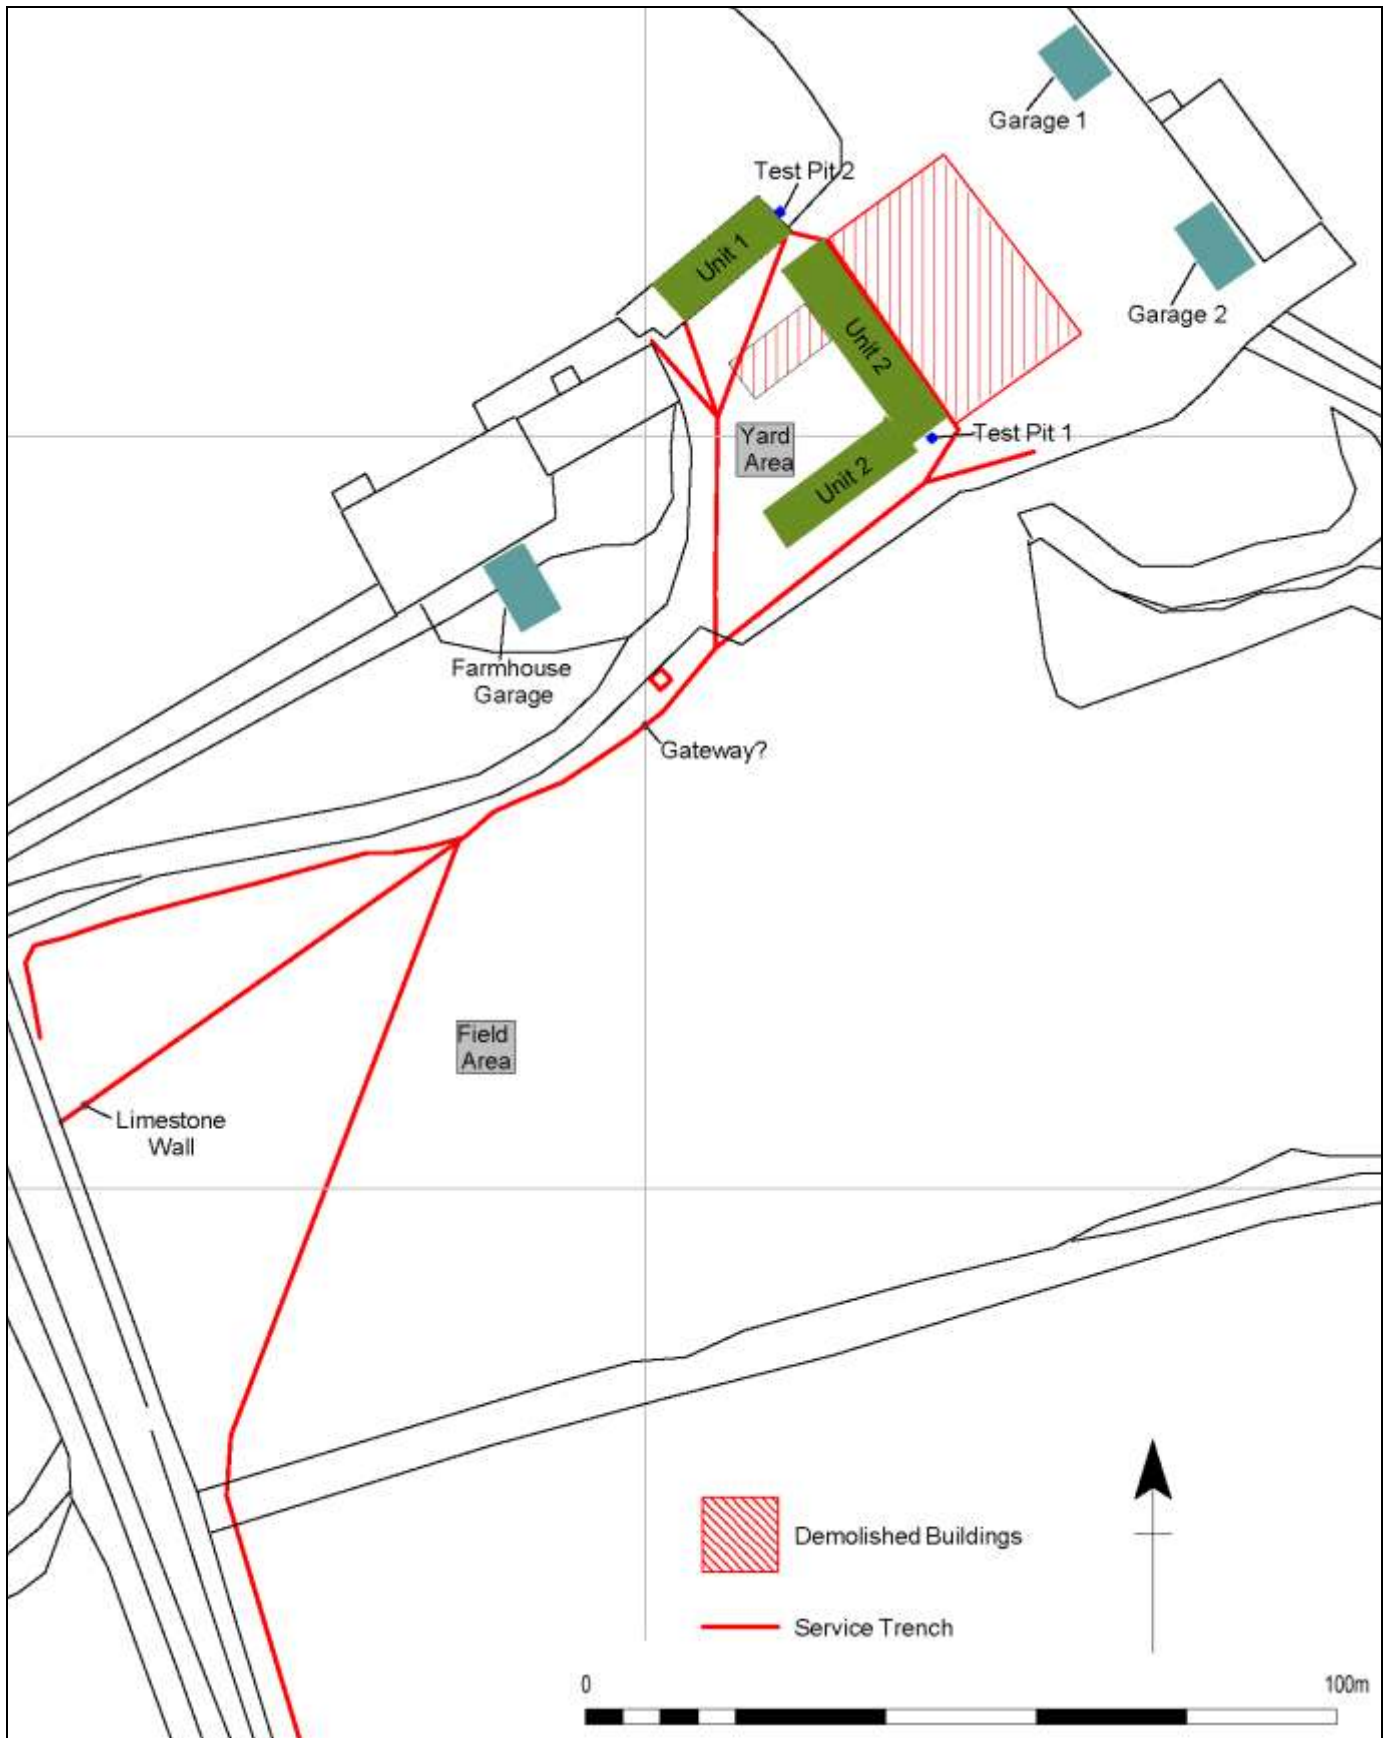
Plan showing complete works carried out (*scale 1:1000*)
